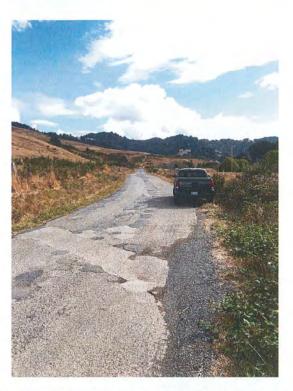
RP 2. Typical section of Chambers Rd (County maintained. State Road No.: FC010). Vehicle traveling east, photo taken facing east.
